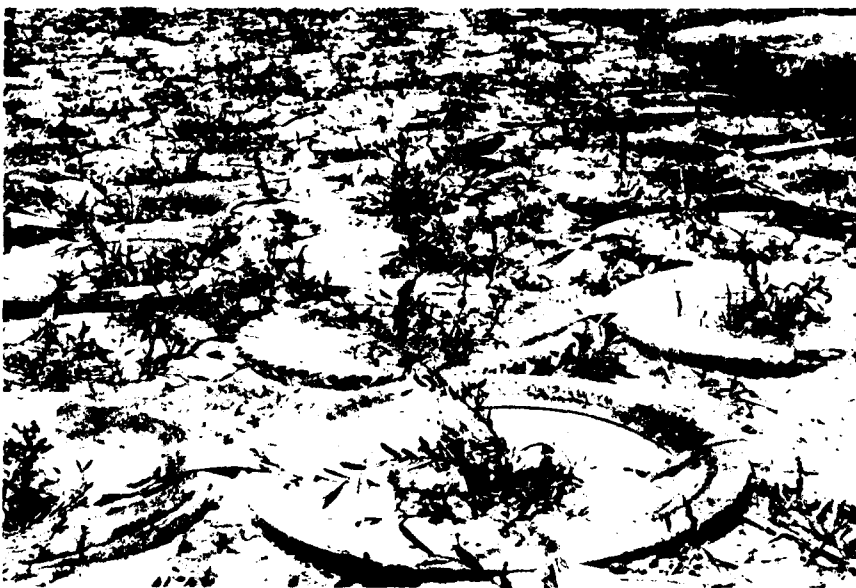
Site A, close-up of rubber tire mattress 2 months after construction. 21 May 81
